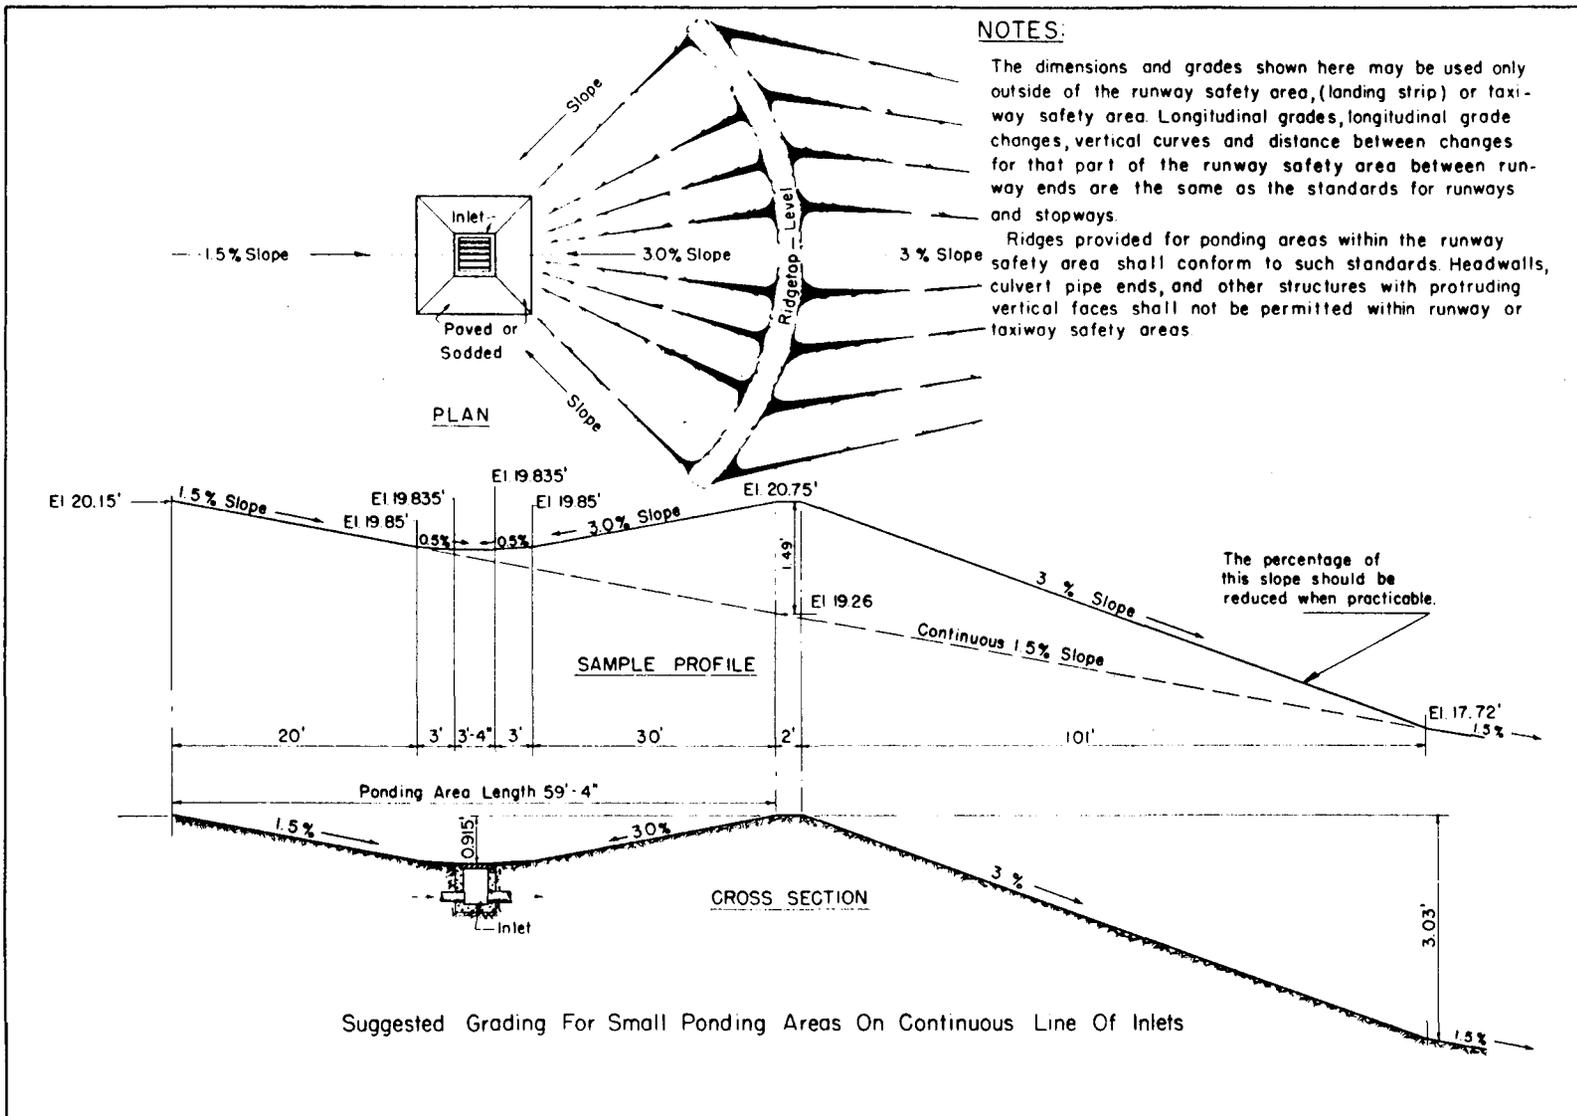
Suggested grading for small ponding areas on continuous line of inlets.
